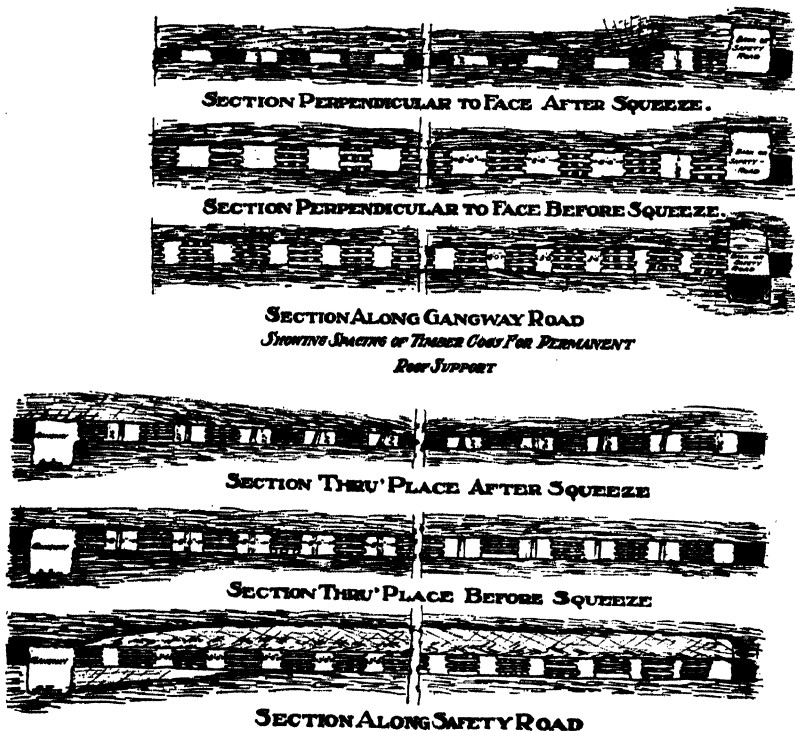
(b).—LONGWALL METHOD WITH TIMBER COGGING.
